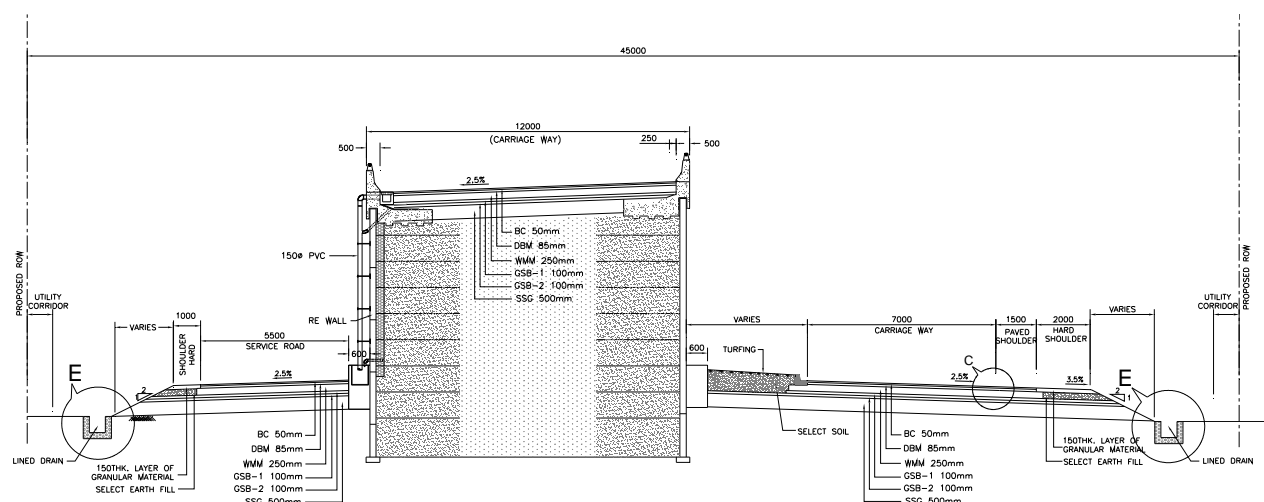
TYPICAL CROSS SECTION FOR UNIDIRECTIONAL FLYOVER APPROACH WITH SLIP ROAD AT 78+107 CH
